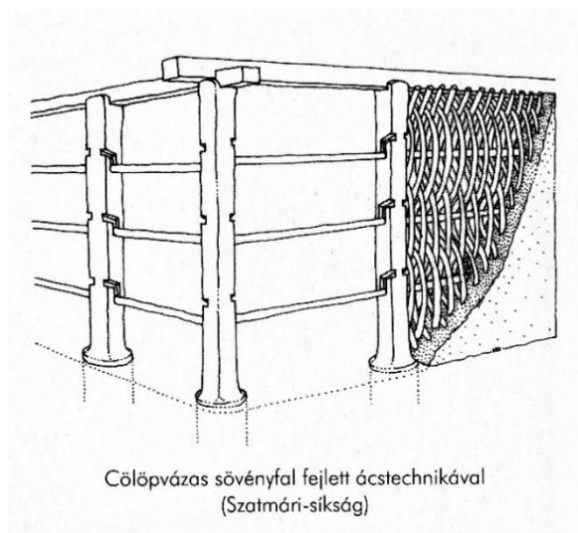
Earthbound post structure with wattle wall, with developed joiner technique (Szatmári-síkság)
